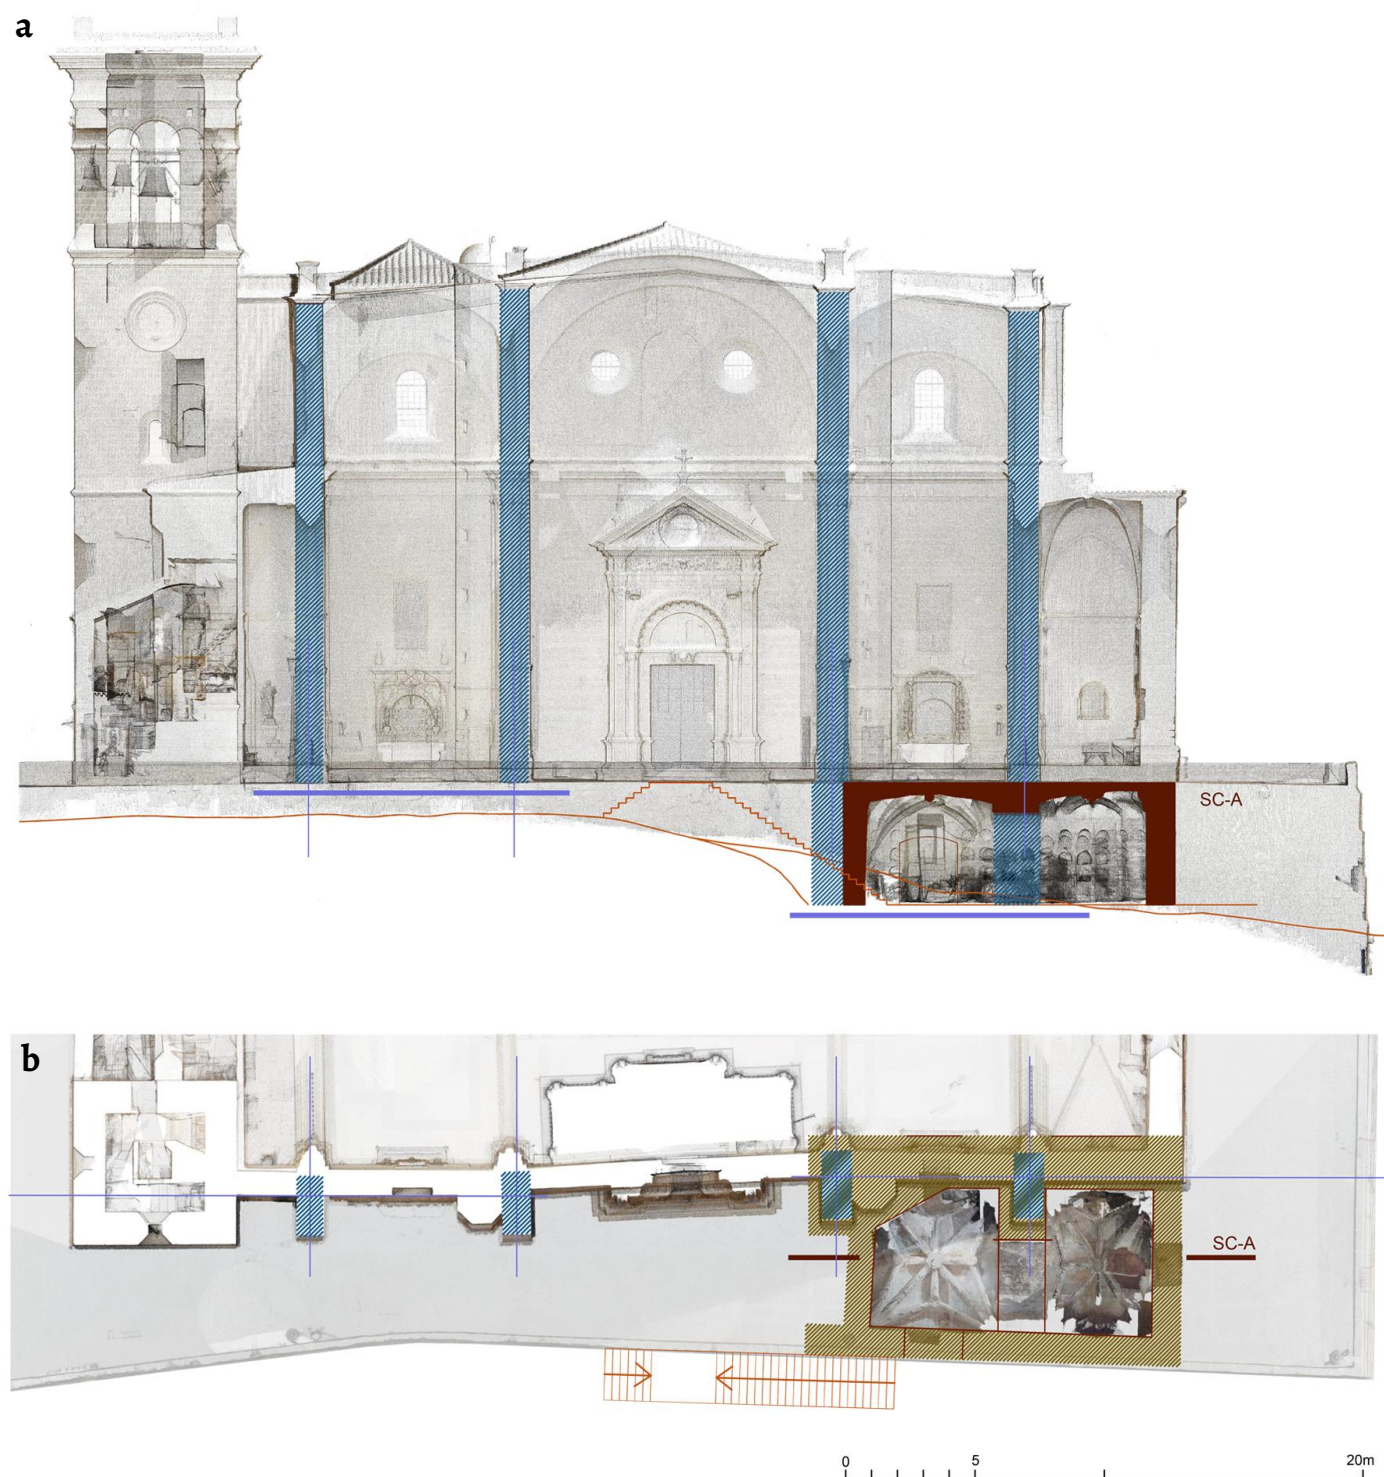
Facade indicating the internal structure of the nave and aisles and possible staircase: a) floor plan; b) elevated plan. The initial construction levels are indicated in purple.
